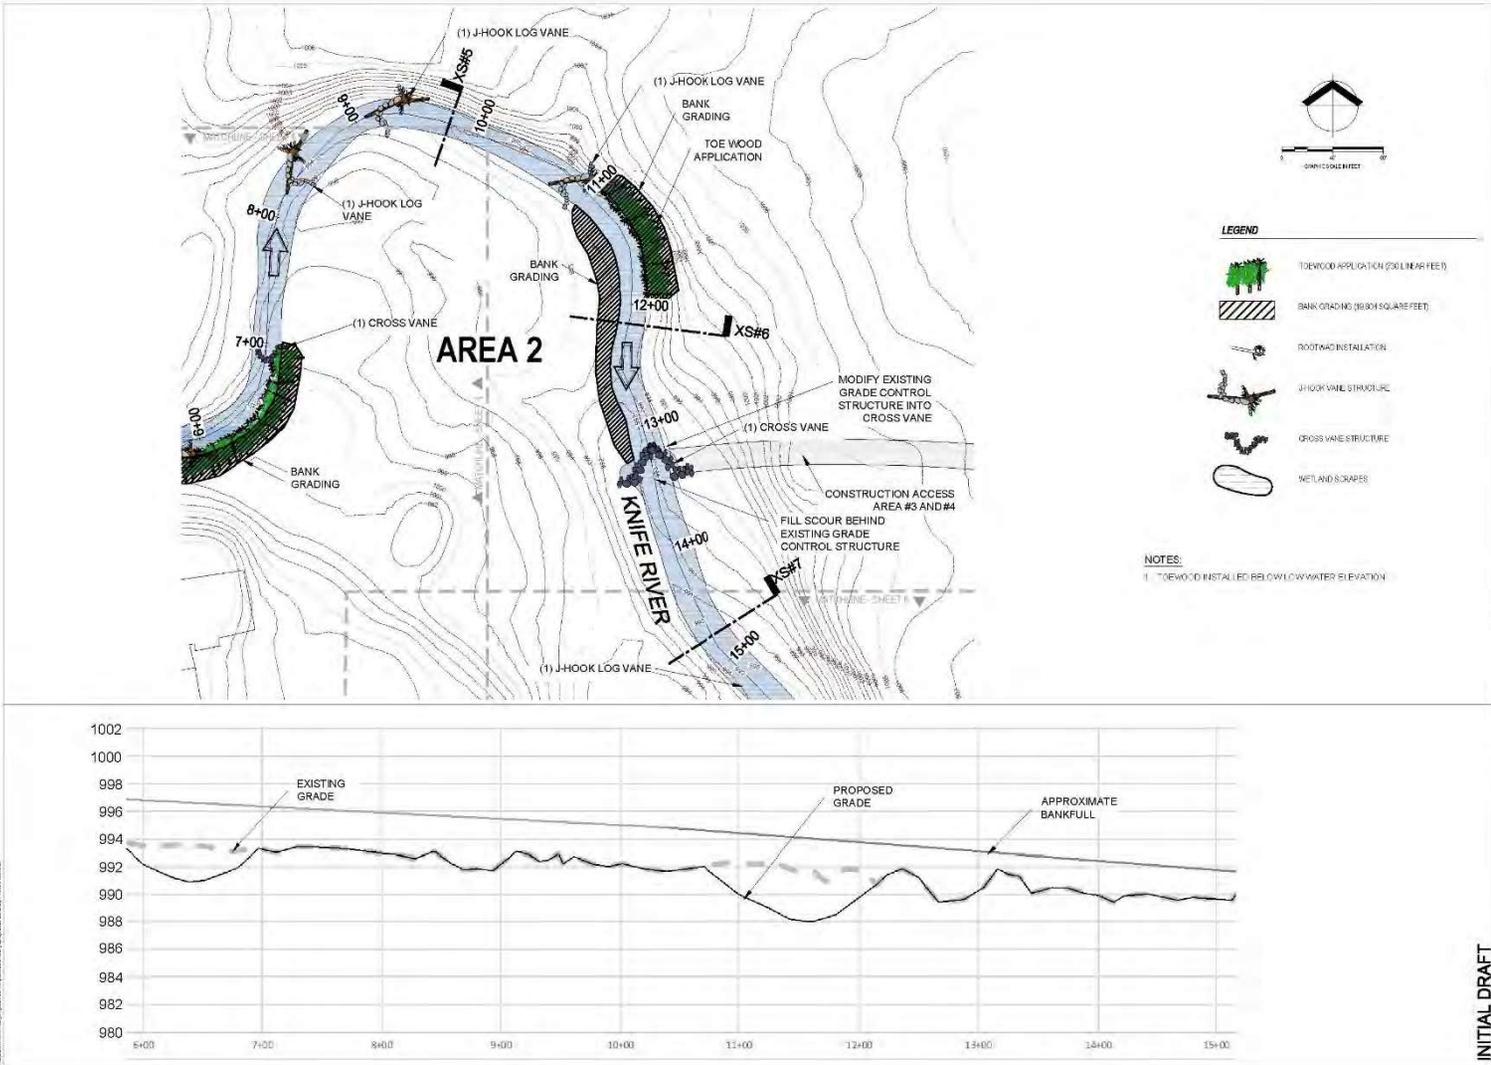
Construction Plan Set: Sheet 4 of 12.
